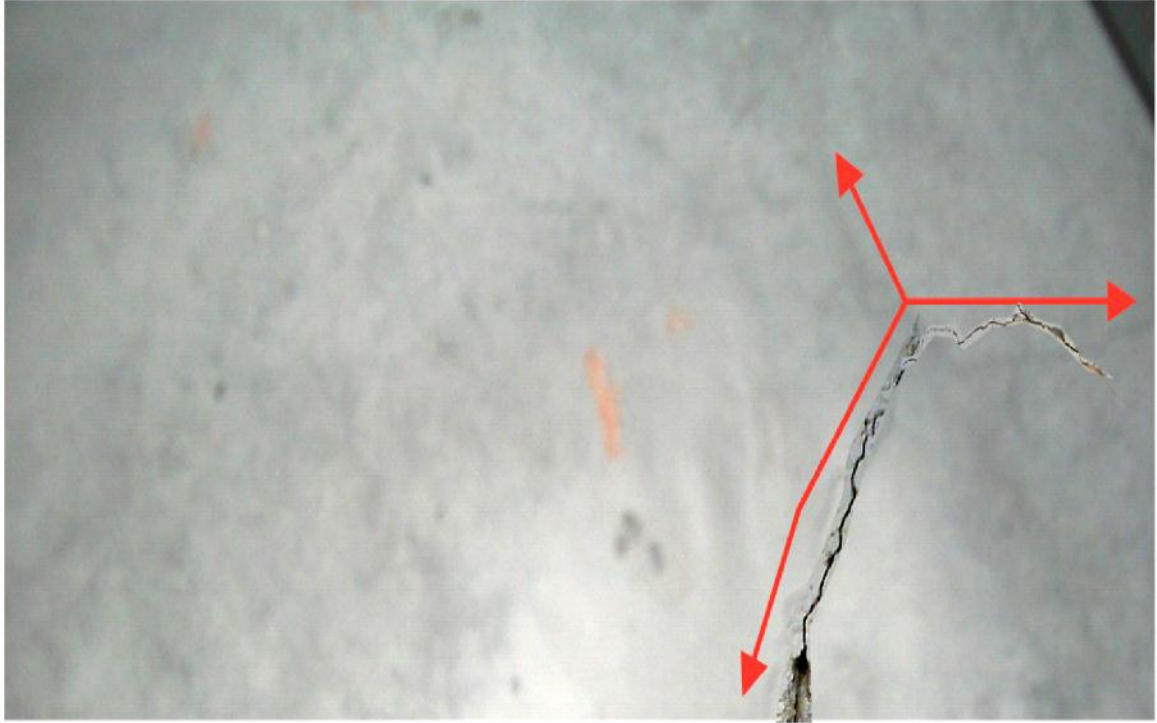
Cracks in slabs (typical)
